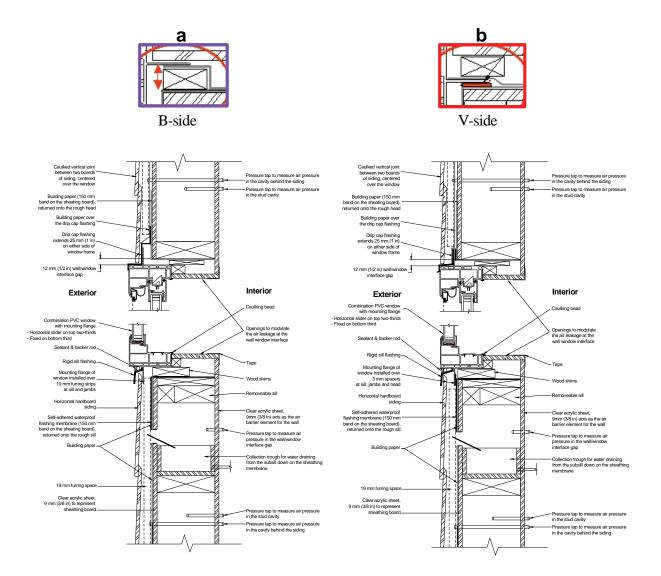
Vertical Sectional views of specimen W3 at the wall-window interface showing the (a) selected practice side (B-side; base-case) and (b) Variation (V-side) specimen configurations.
